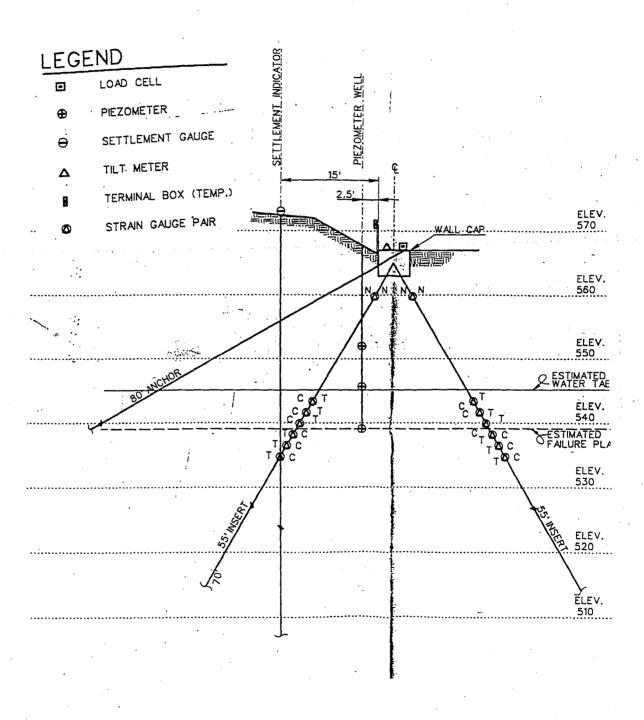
Cross-section of Instrumented Wall at Station 1+70. (Wolosick, 1994)
